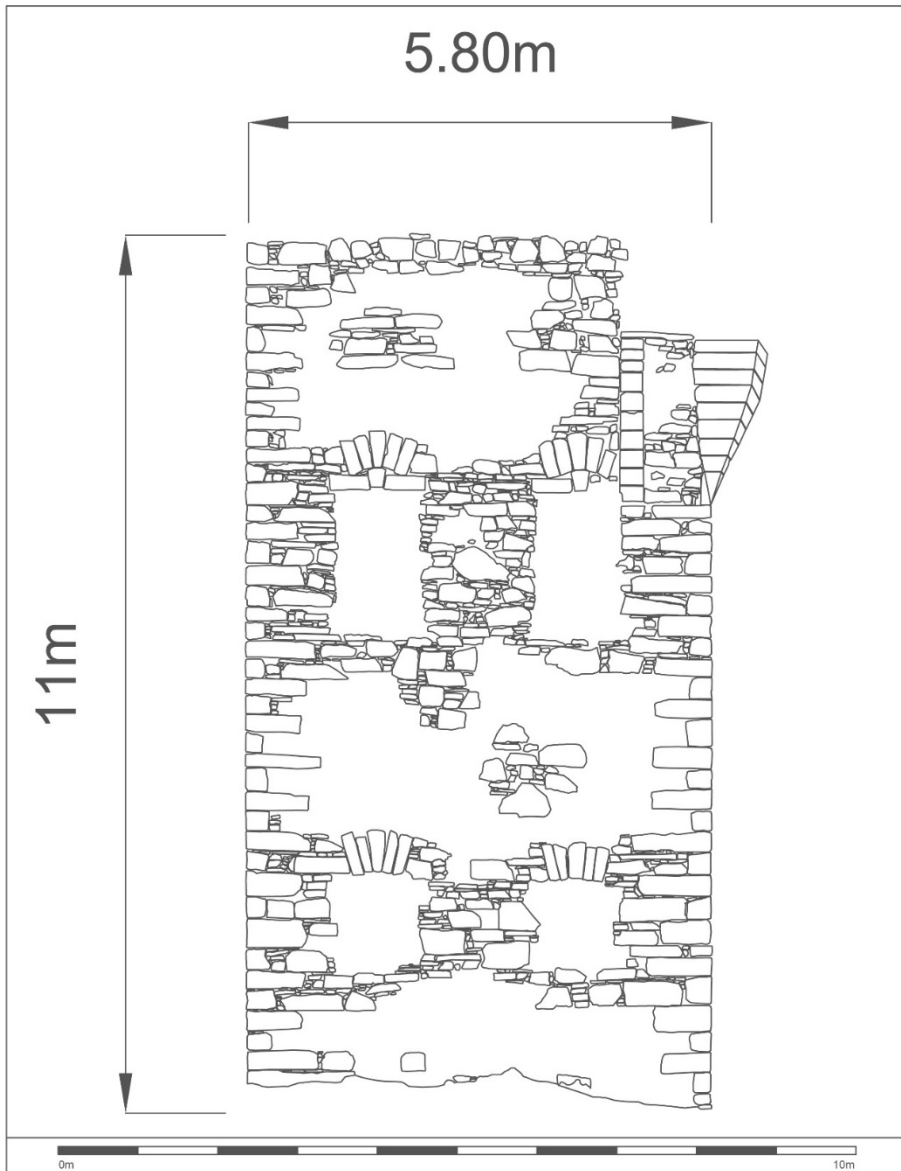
External elevation of the north-east wall of the signal tower at Crohy Head Signal Station.
